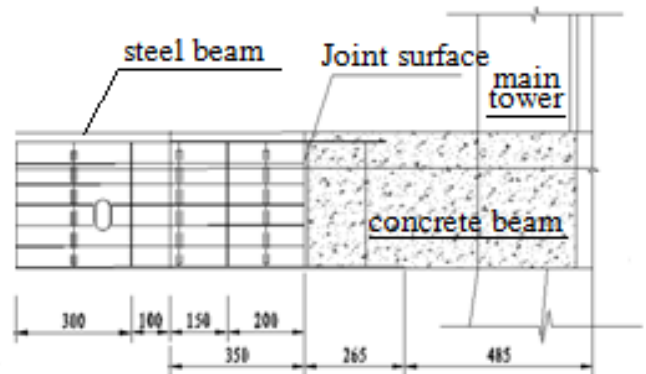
Layout of the steel-concrete joint section of real bridge.
